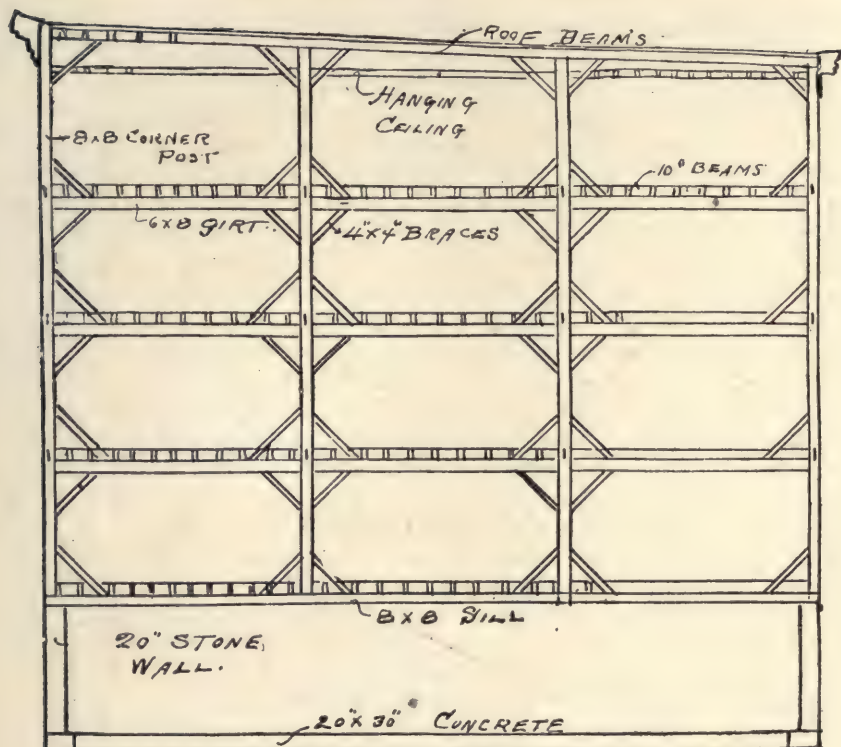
Side Elevation Showing the Framing of Gables and Party Walls.
